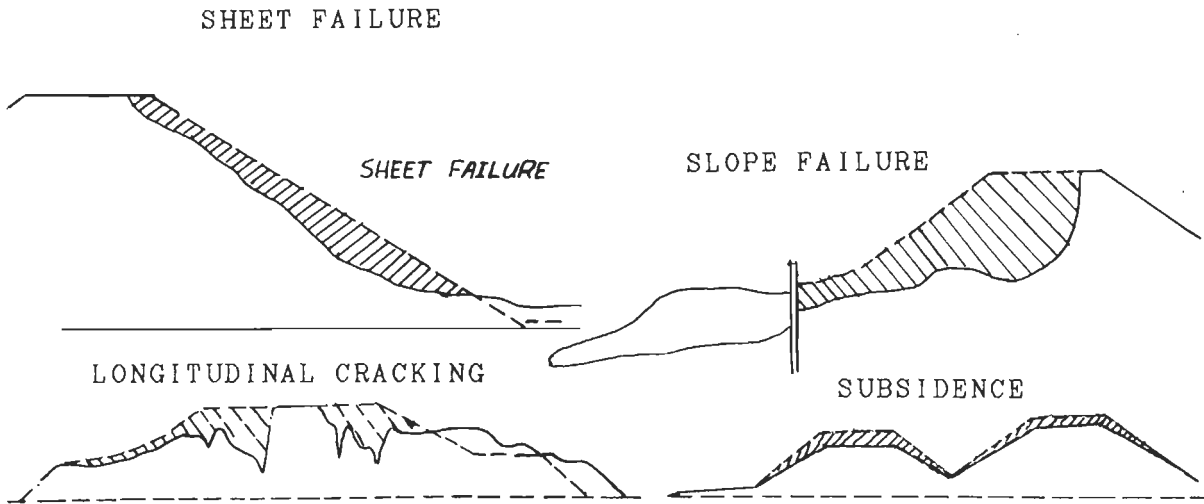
TYPES OF EMBANKMENT FAILURES.
